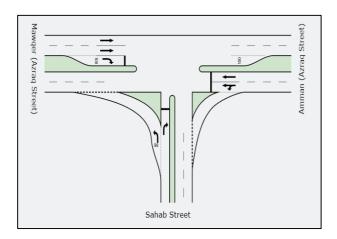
Existing geometric layout for Dallah Sahab intersection.
